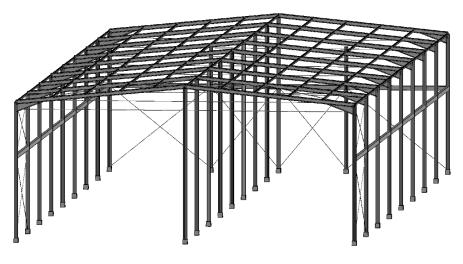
Structural design of hypothetical example 3 (pre-cast concrete framing)
